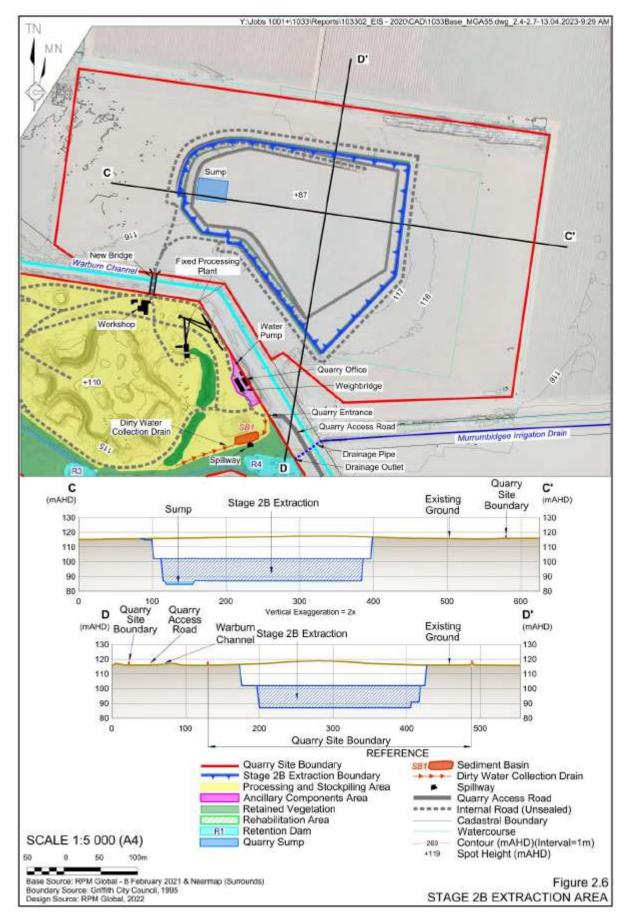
Proposed Extraction Stage 2B and Cross-Sections
